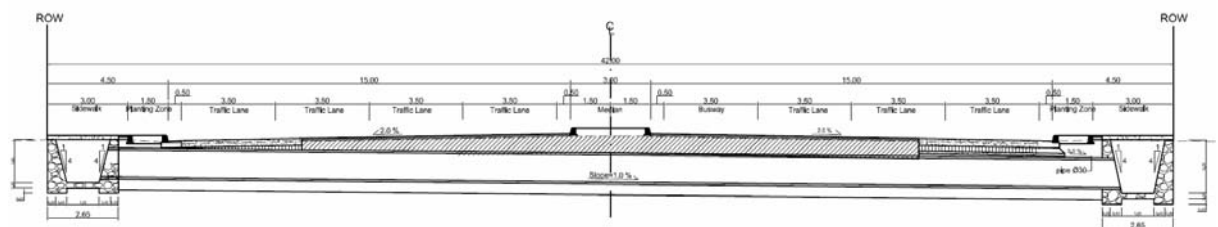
Section of Cross Drain Pipe and Catch Pit
